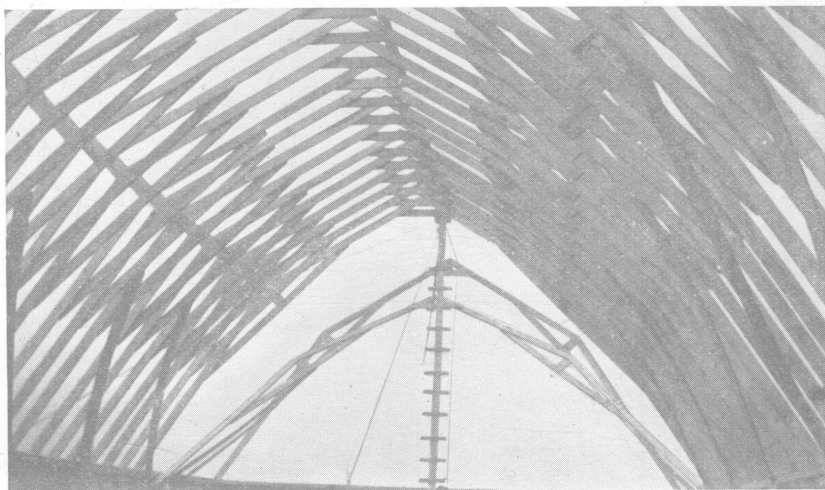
A truss being raised by the use of the gin pole and block and tackle. End truss already erected and braced.
